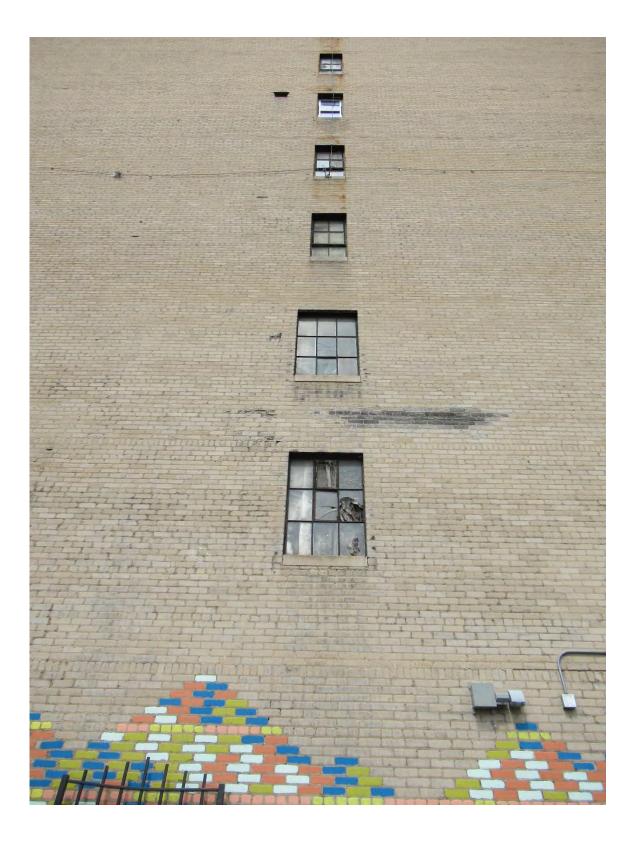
Exterior, West Façade, Looking Up. 6/17/2019
